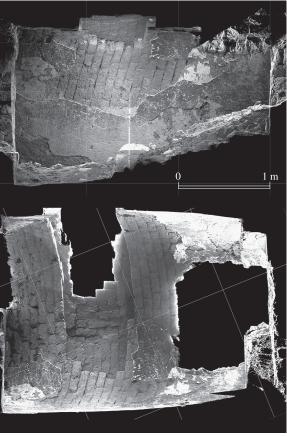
Cross-Sections and Vaulted ceiling of Mud-brick structure in Building 8 in *Akoris* 1981–1992 (on 1m by 1m grid)
